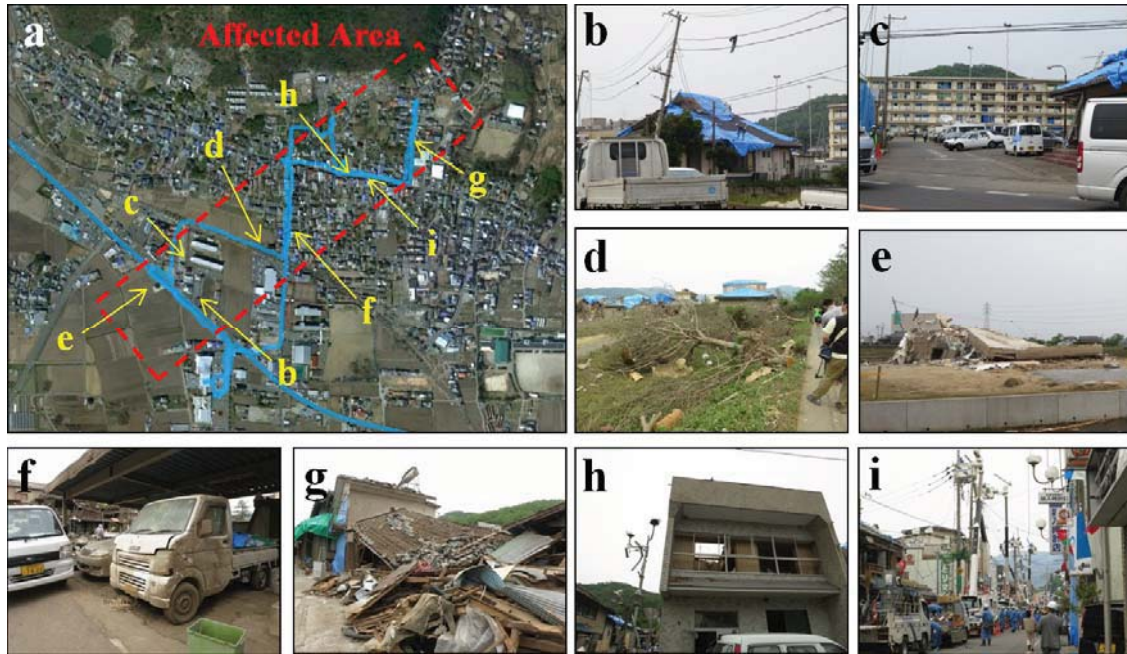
(a) The area of field survey in Hojo district, Tsukuba City and photo shooting locations, (b) Blue-sheet on the roof, (c) Damage on the side wall of an apartment building, (d) Fallen trees along street, (e) Overturned wooden house with its concrete base, (f) Cars stained with tornado's mud water, (g) Buildings that reduced to debris, (h) Brown-off of the roof (the sky is seen from the window), (i) Restoration work of electric poles and cables.
